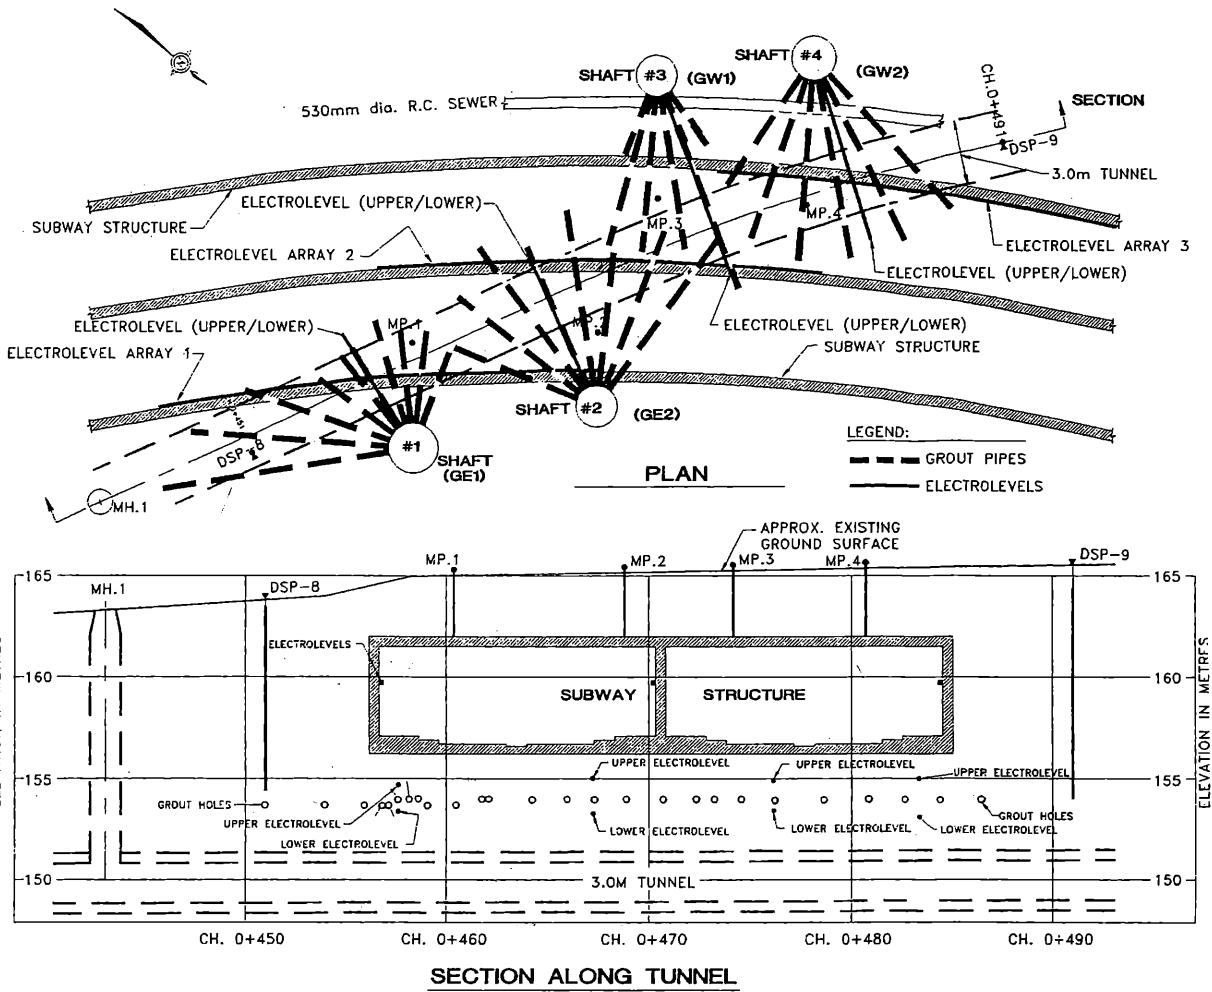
Plan Of Grouting And Monitoring For Tunneling Under The Spadina Subway
